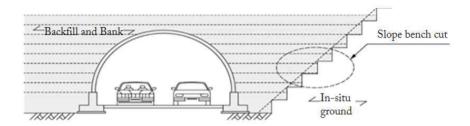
Backfilling of intersection and banking and cut sections
